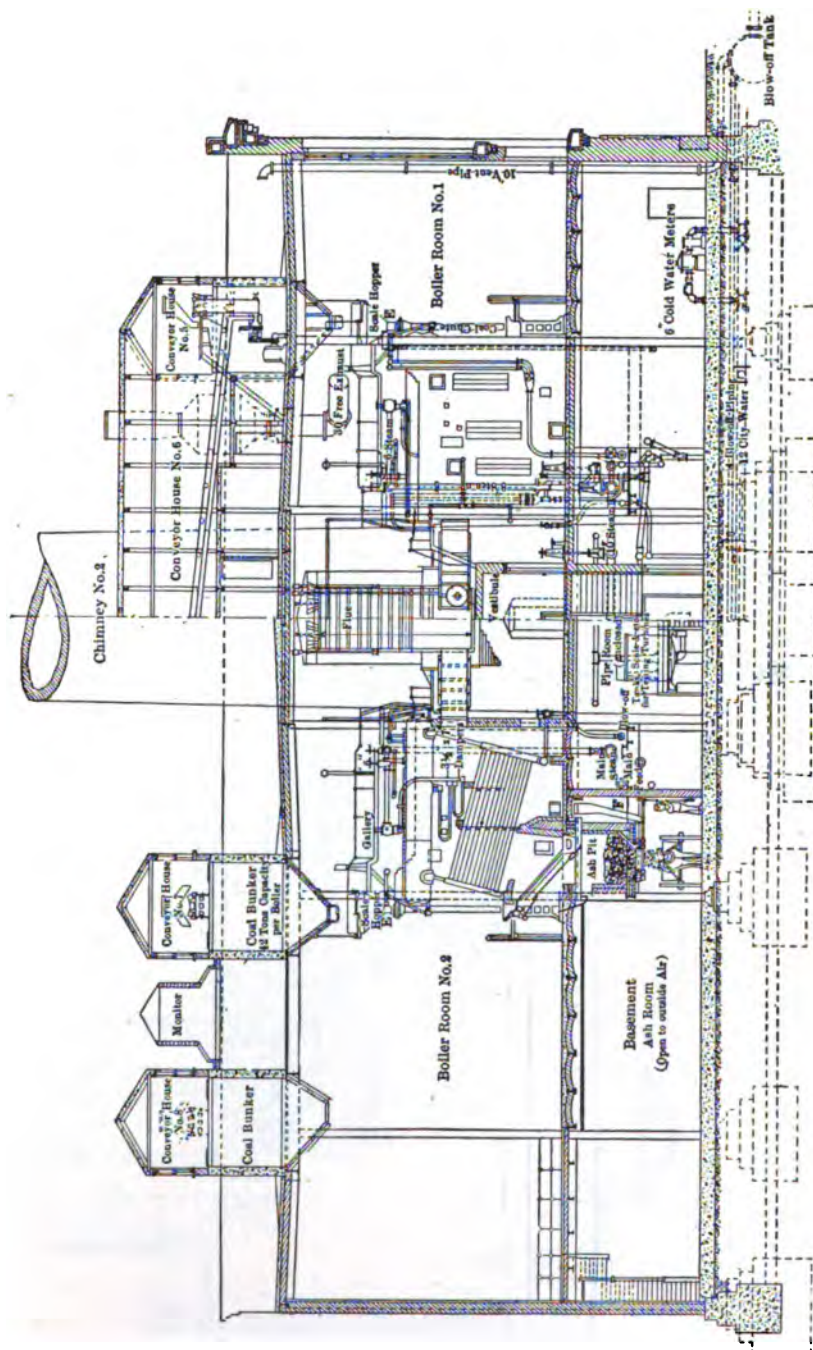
Boston Edison : Transverse Elevation of Boiler-House.
